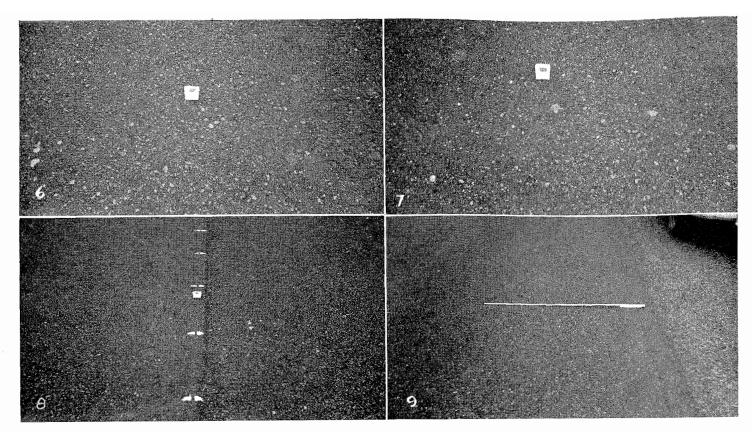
Close-up of surface, 6.6% rubber added. PHOTO 7—Close-up of surface, 4.8% rubber added. PHOTO 8—Plant-mix with rubber, right; plant-mix without rubber, left. PHOTO 9—Plant-mix with rubber, foreground; plant-mix without rubber, background. (Pictures taken February 14, 1951.)
